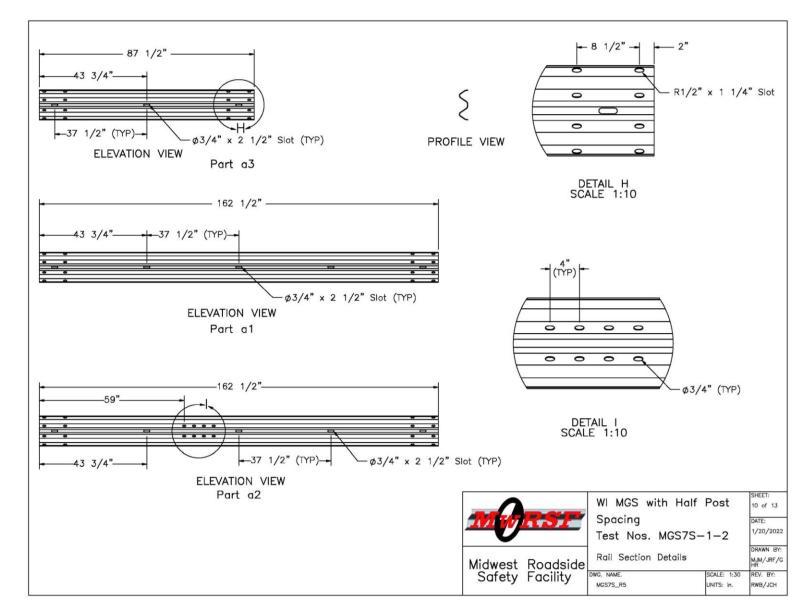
Rail Section Details, Test Nos. MGS7S-1 and MGS7S-2
